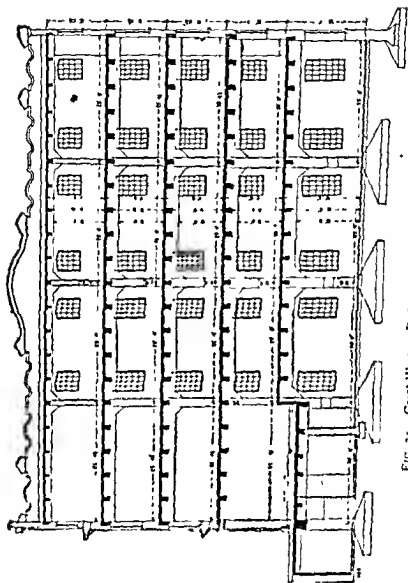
Great Western Railway Stationary Warehouse (Section).
